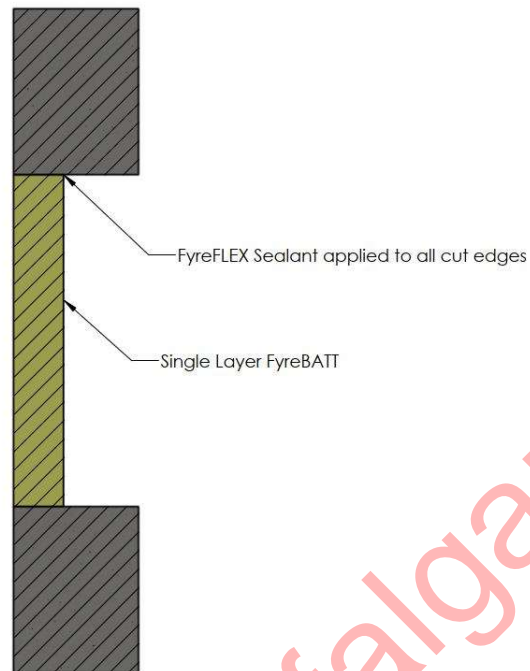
Blank seal protected with single layer of FyreBATT in concrete / masonry wall
